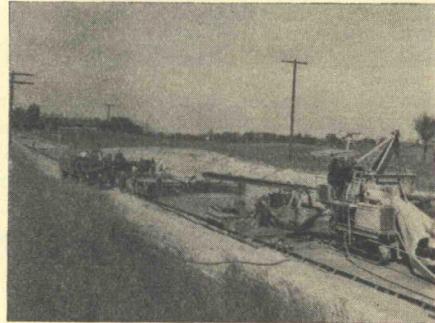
Train of Equipment Used in Constructing Monolithic Vibrated Brick Pavement. This view shows the approximate normal spacing.
